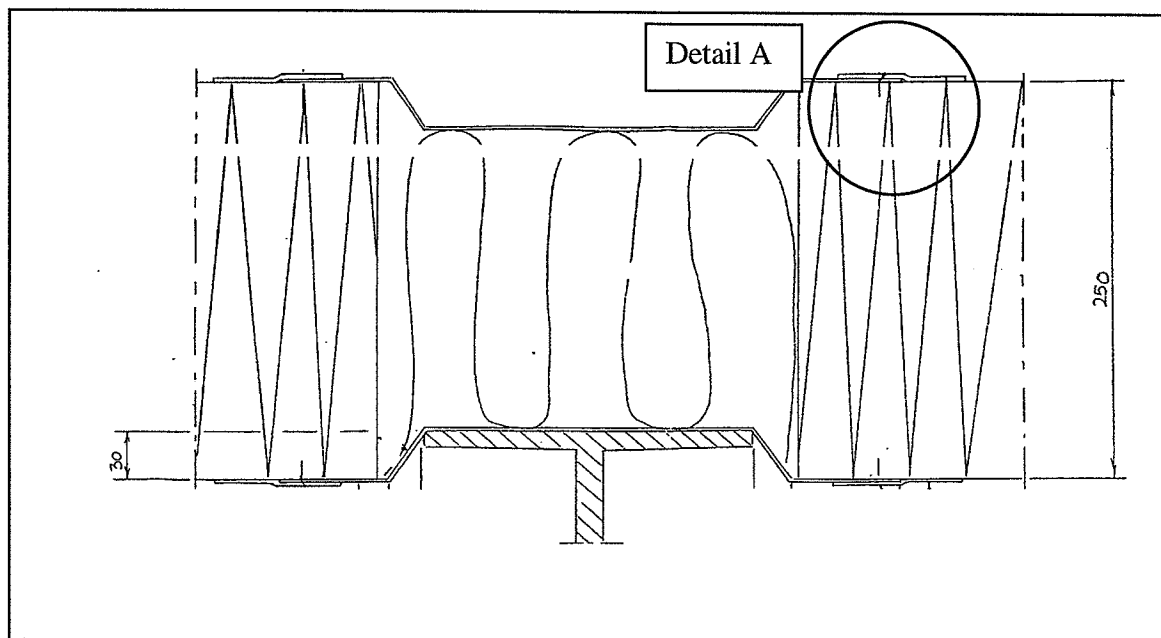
The assembly details for the sandwich elements. A special joint steel profile is fixed with pop-rivets onto the top- and bottom plate of the two sandwich elements. The joints are tightened by a two-step-sealing, shown in Figure 6. The gap between the elements is then filled with PUR-foam in situ. Note: The I-beam is in contact with the lid only if there is no water in the pit. Otherwise the lid is floating above the steel construction.
